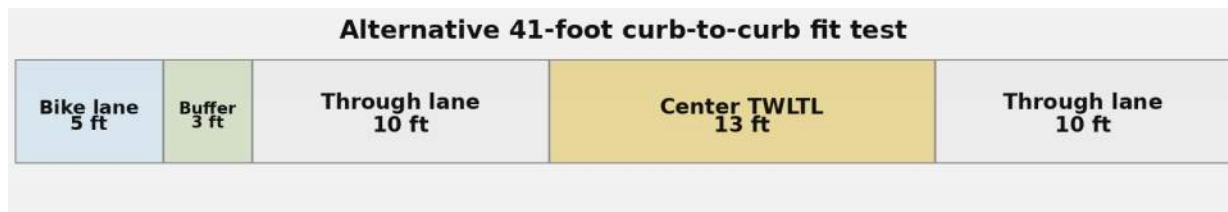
B. Alternative 41-foot curb-to-curb fit test showing one-way buffered bike lane concept: 5-foot bike lane + 3-foot buffer + 10-foot through lane + 13-foot center TWLTL + 10-foot through lane. This is a planning-level concept only, not a final design.
